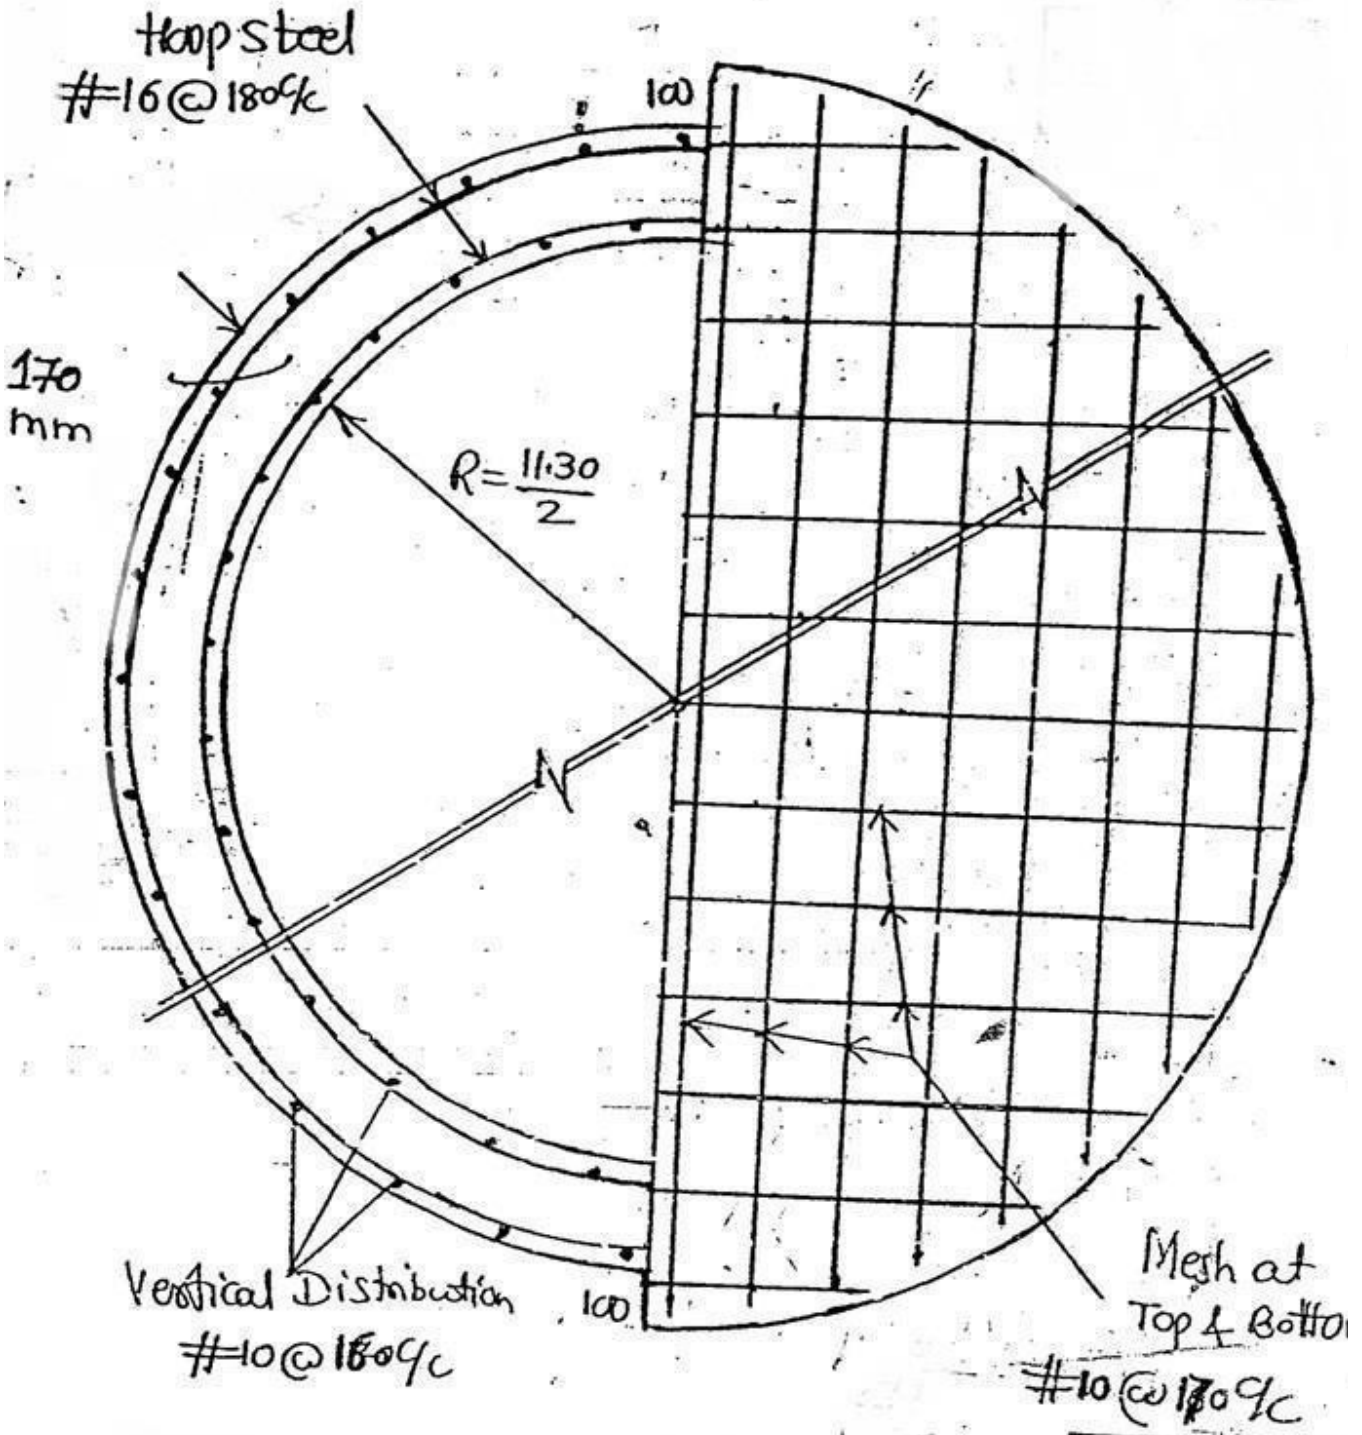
half plan @ through wall and half plan @ bottom of circular water tank
